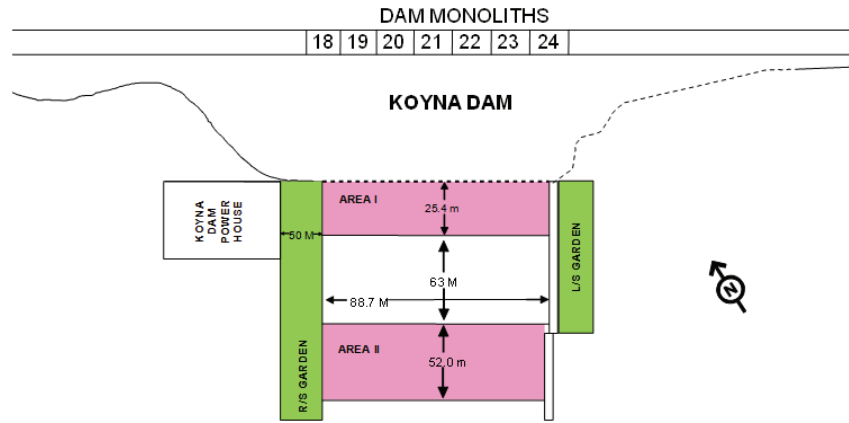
Schematic diagram showing the location of Koyna Dam and Power House
